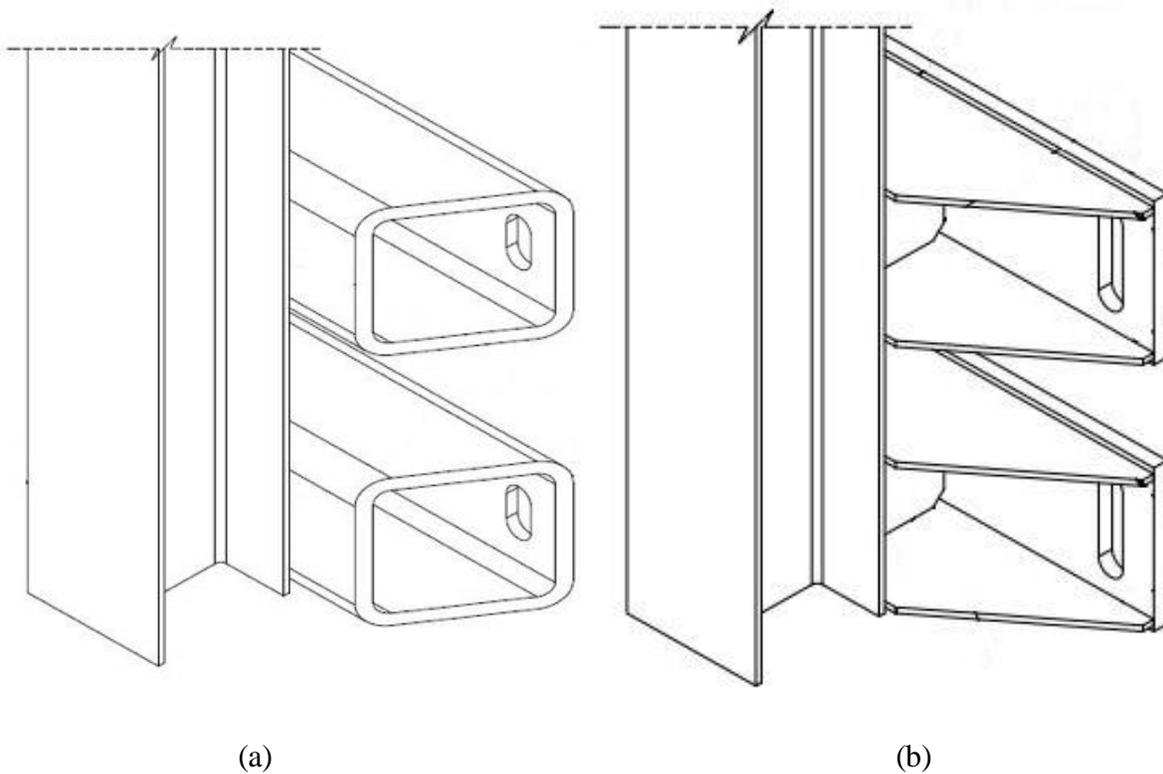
Deck Side Vertical Adjustment in (a) Spacer Tubes or (b) Built-up Spacers
